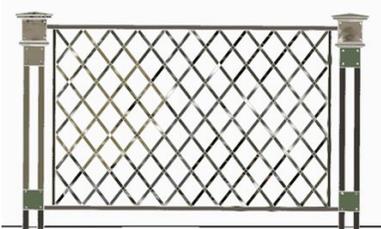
Drawing of existing railing on the unused automobile lanes on the east and west side of the K&I Bridge.
